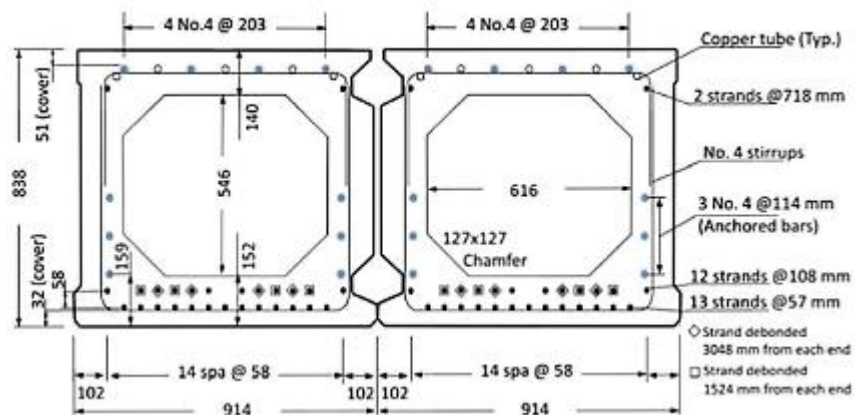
Cross-sectional view of box girders used for FHWA beam splice test (Maya and Graybeal 2017).
